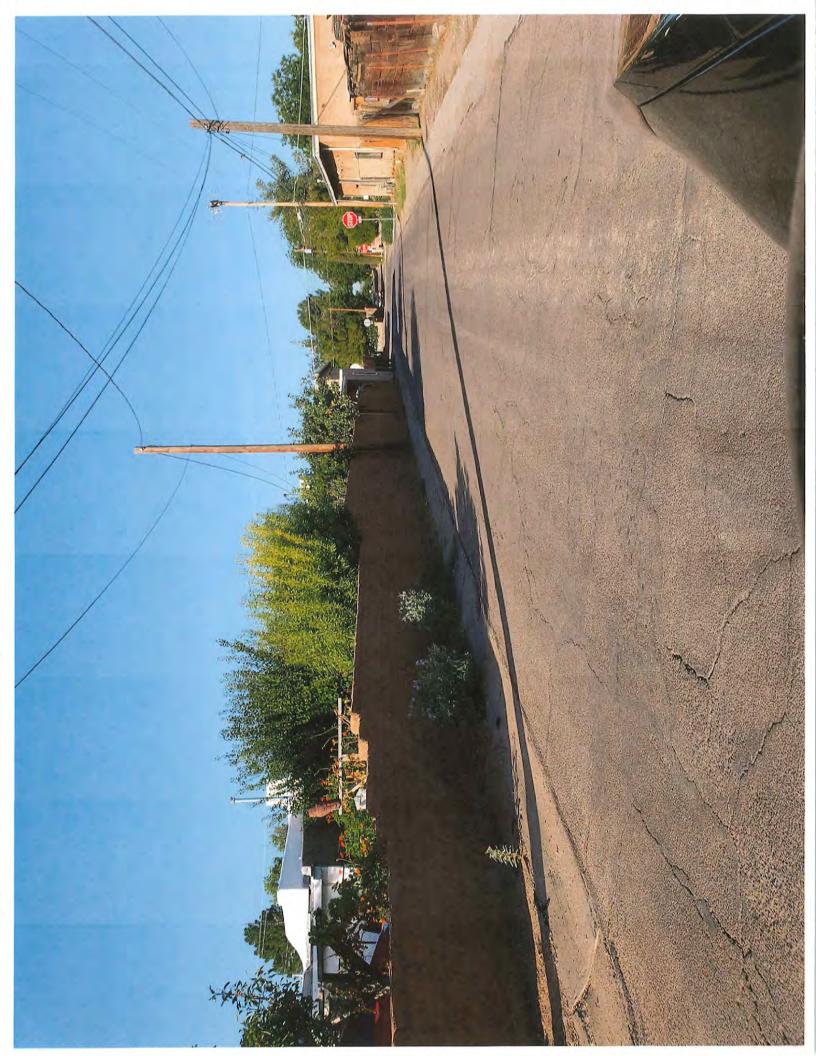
PHOTOS OF THE NEW STRUCTURE AND THE PROPOSED LOCATION OF THE WALL (FROM CALLE DE SAN ALBINO)
